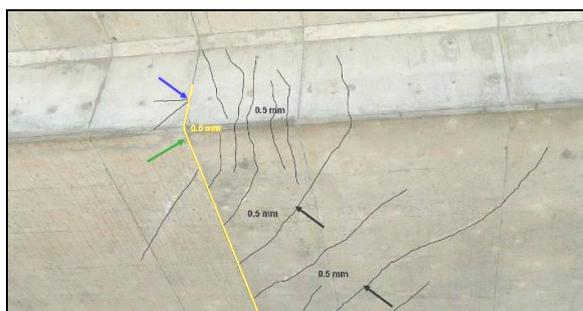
Cracking of concrete on underside of deck at coupling joint of cables
